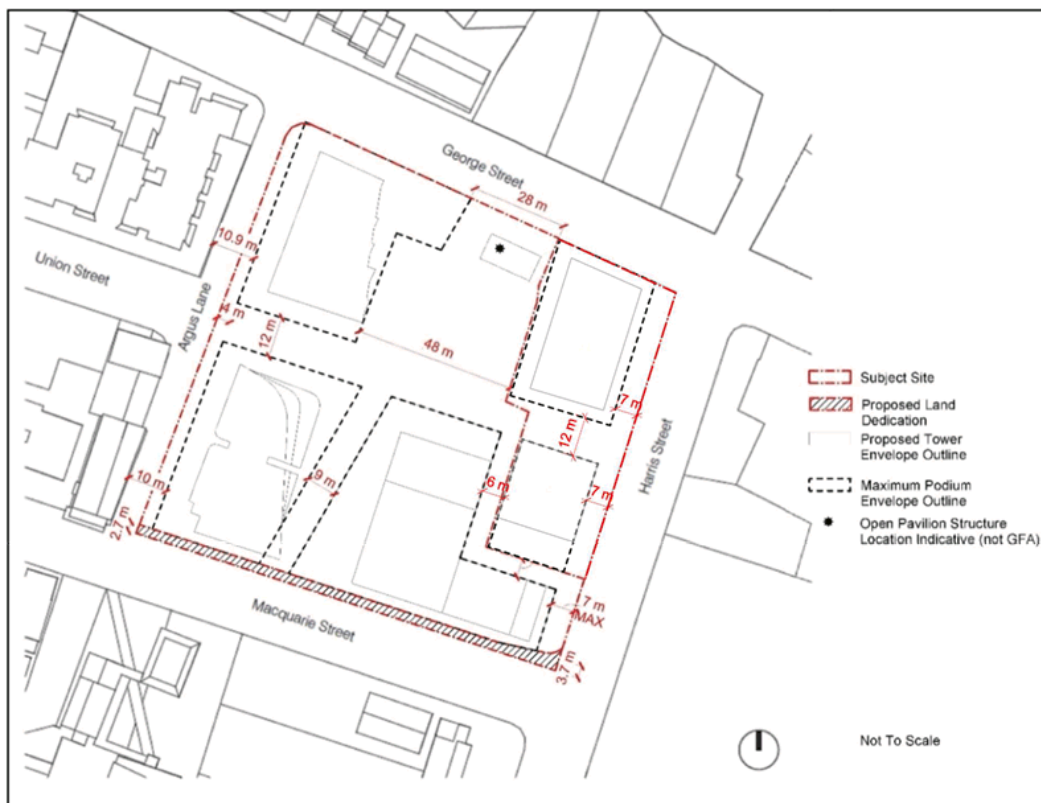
Control diagram: Setbacks and separations at street level
